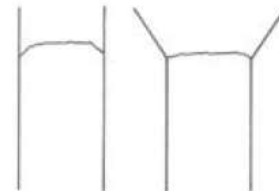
Plastic-settlement cracking at change in section in columns or at stirrups
